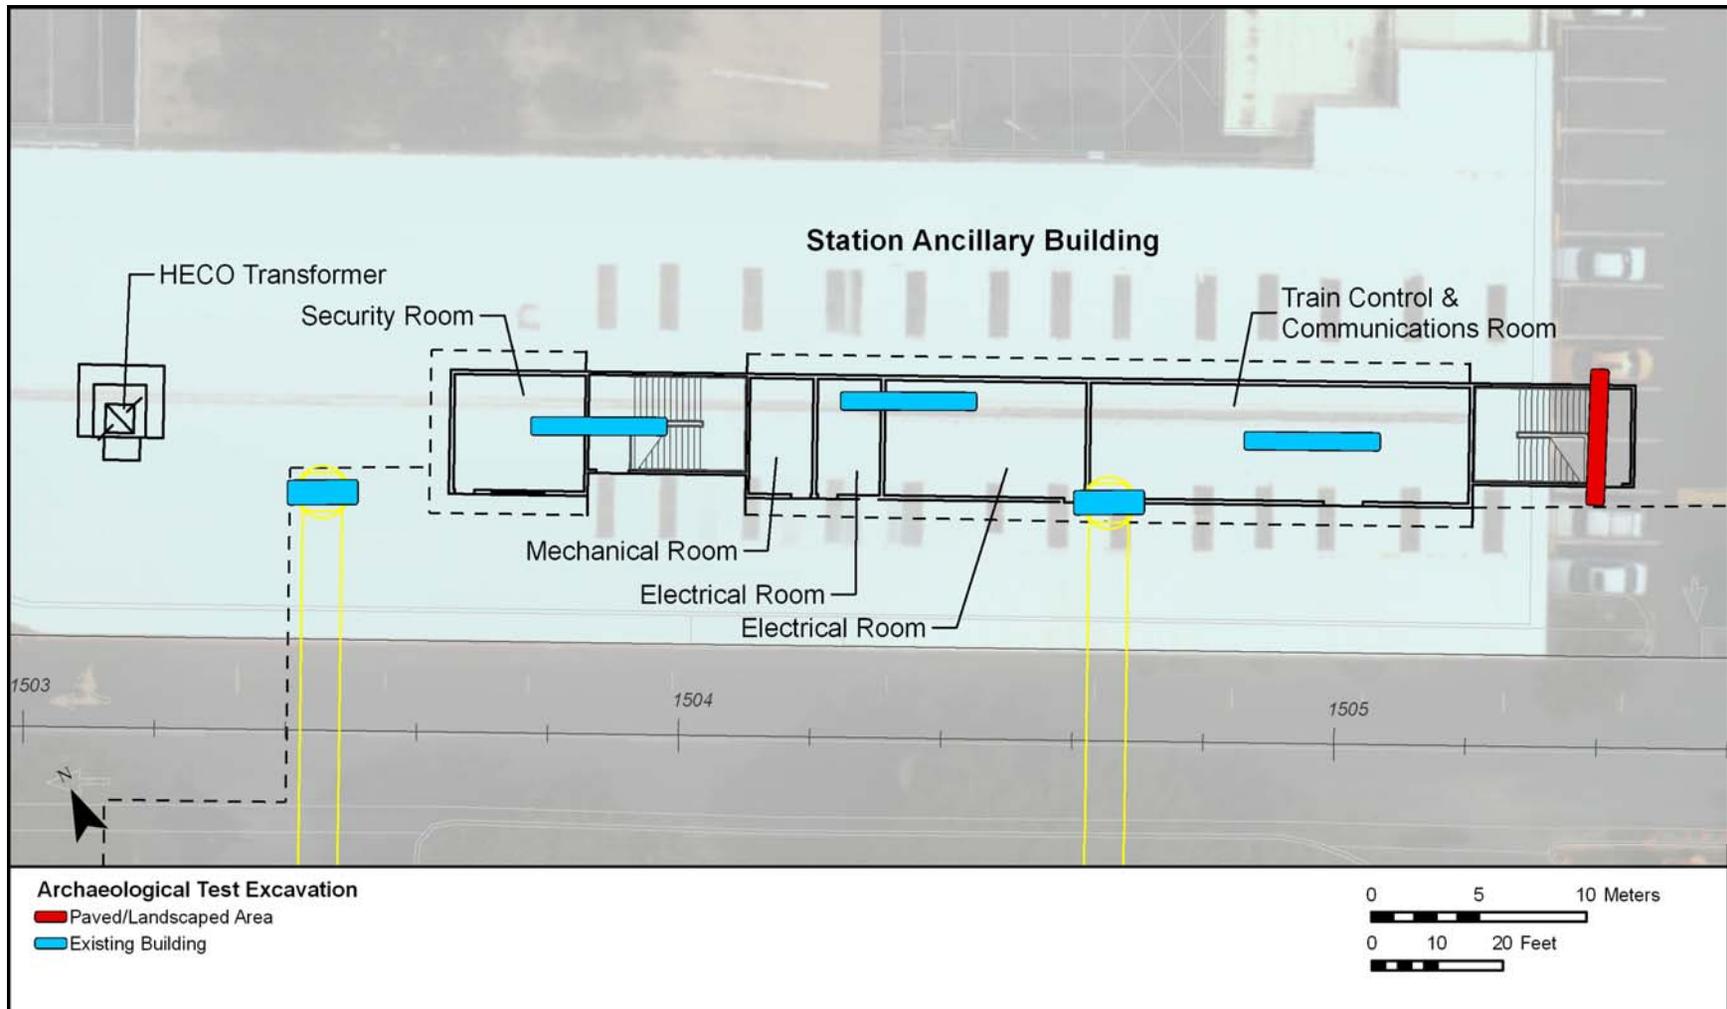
Ala Moana Center Station, detail of (*mauka*) Station Ancillary Building foundation layout showing proposed locations for archaeological inventory survey testing (Four 2' by 20' test trenches at *mauka* Station Ancillary Building)
